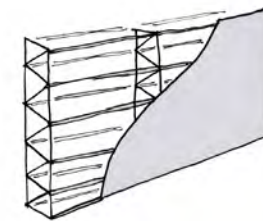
Structure of new building consists of steel frame with cladding, structure is hidden.
